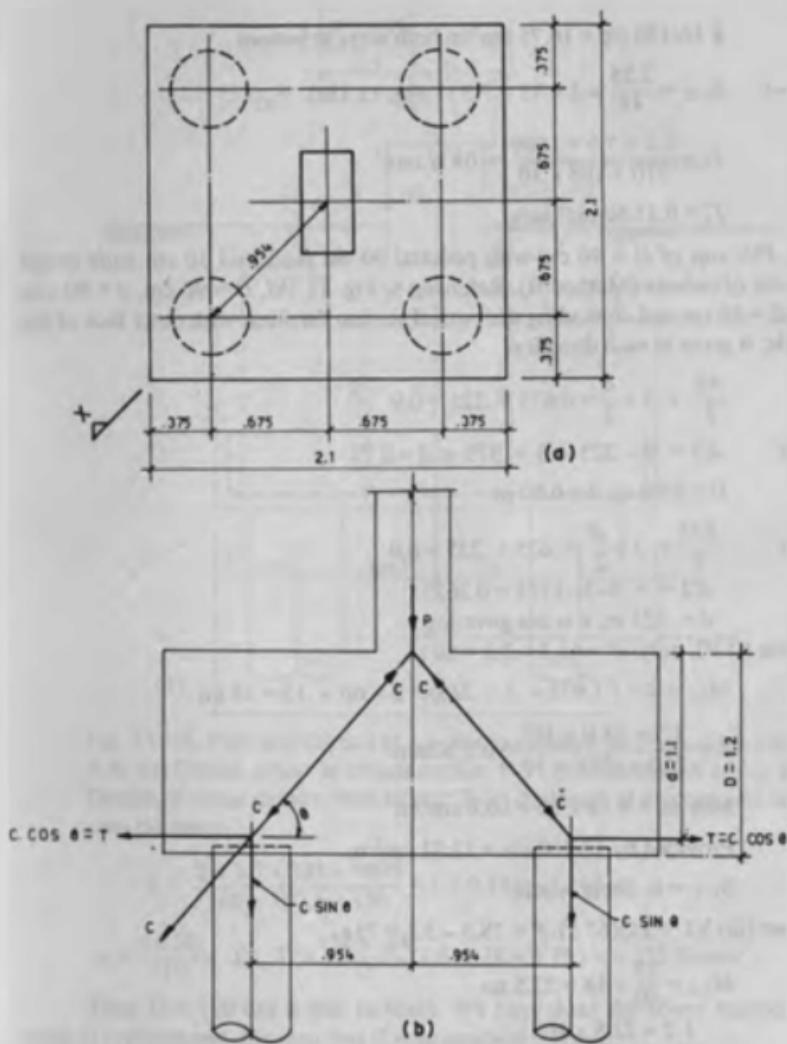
Design of pile cap by truss analogy. (a) Plan of pile cap; (b) Section X-X.
